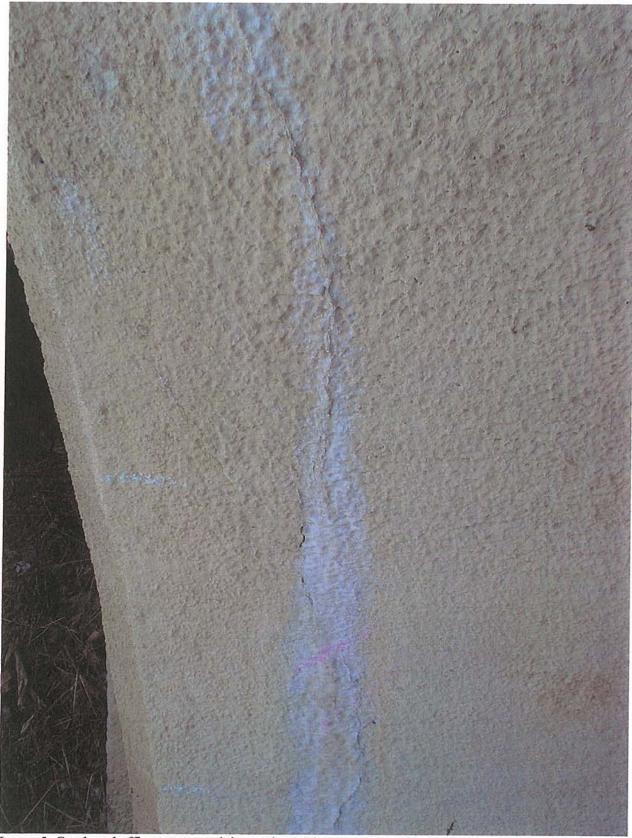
Crack and efflorescence staining at the northwest corner of the arch
